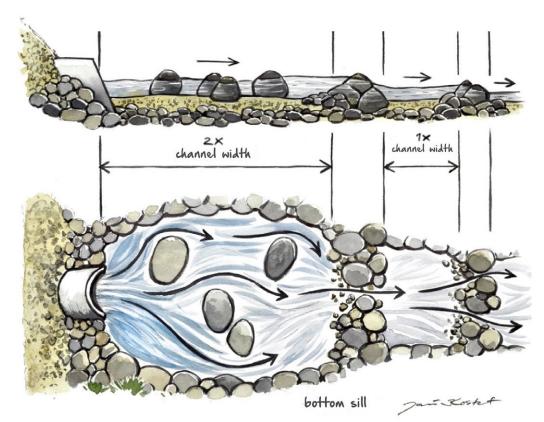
An inaccessible culvert can be restored by building sills with stones and timber in the channel below the culvert. The purpose of the sill is to raise the water level in the culvert and to enable the passage of aquatic organisms through it. Adding stones can also eliminate a fall below the culvert to the channel bottom and/or the water surface. Photo: Jari Kostet/Metsähallitus 2020.
